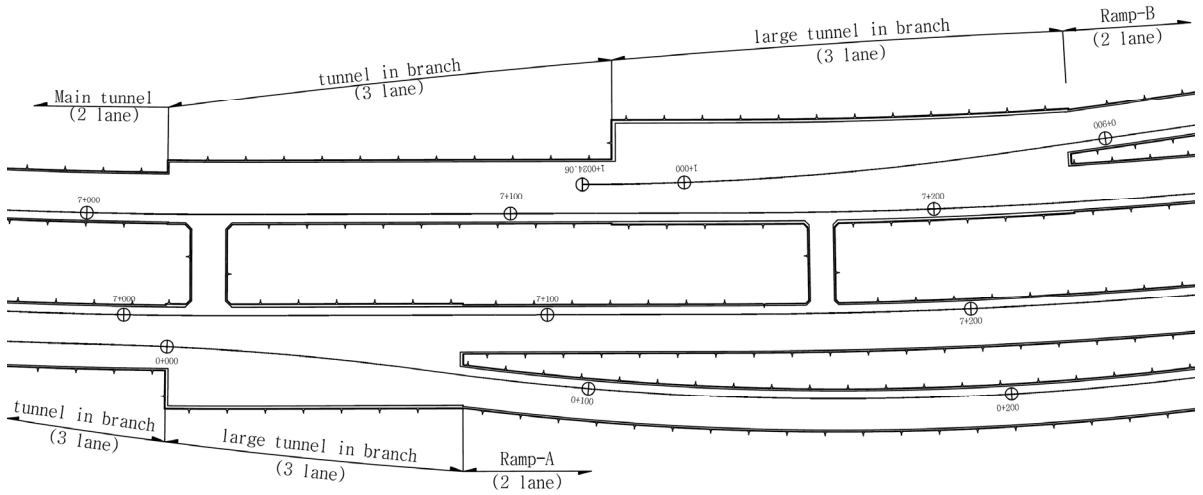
Road alignment plan in branch section (Seoul ○○○ tunnel)
